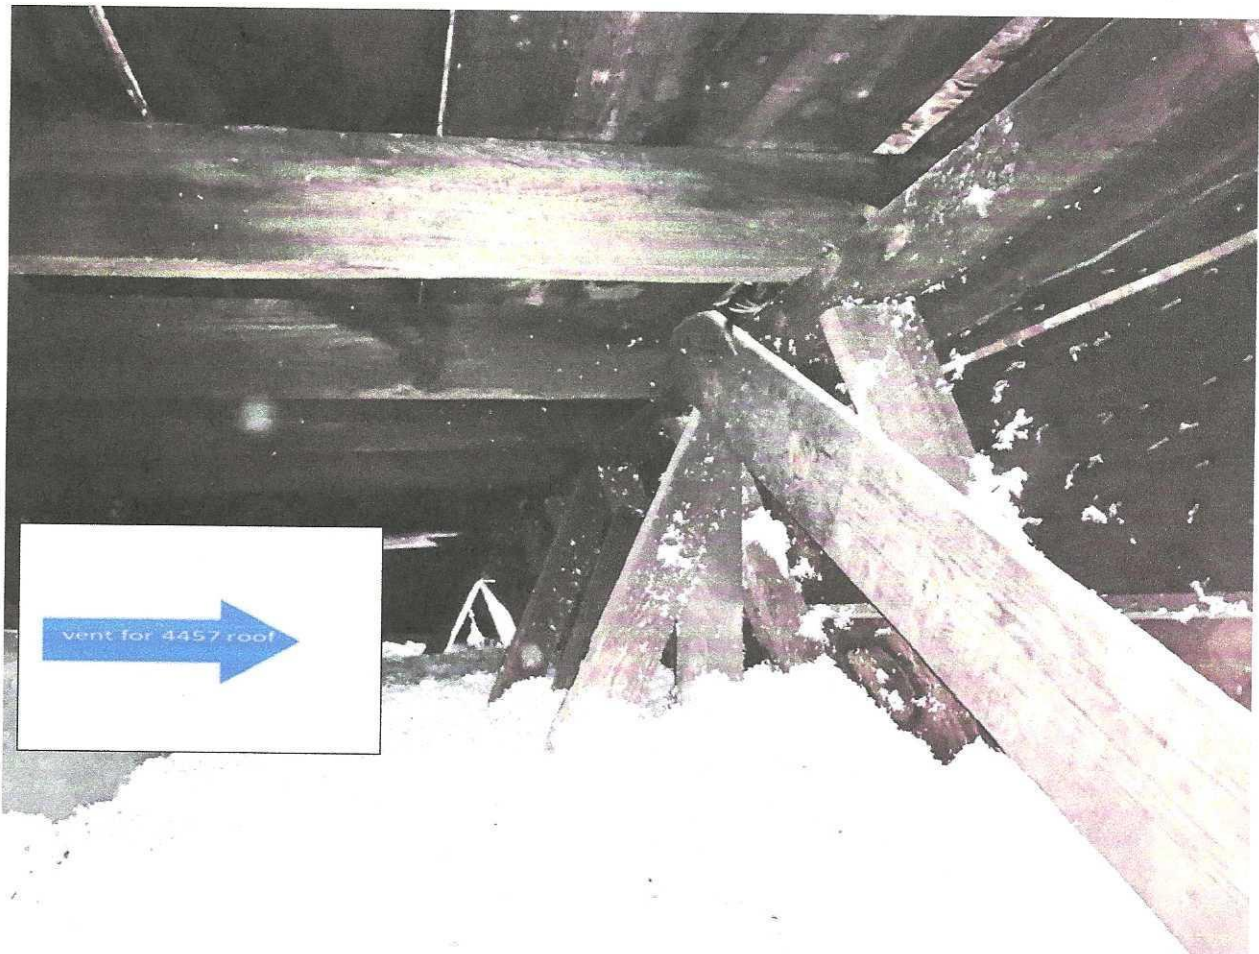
Common attic of 4457 – 4459 with arrow indicating the attic vent for 4457 when viewed through 4459 side of the attic.
